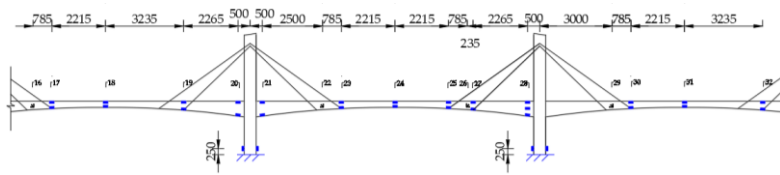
Layout charts of stress test of main girder section (Unit:cm).
